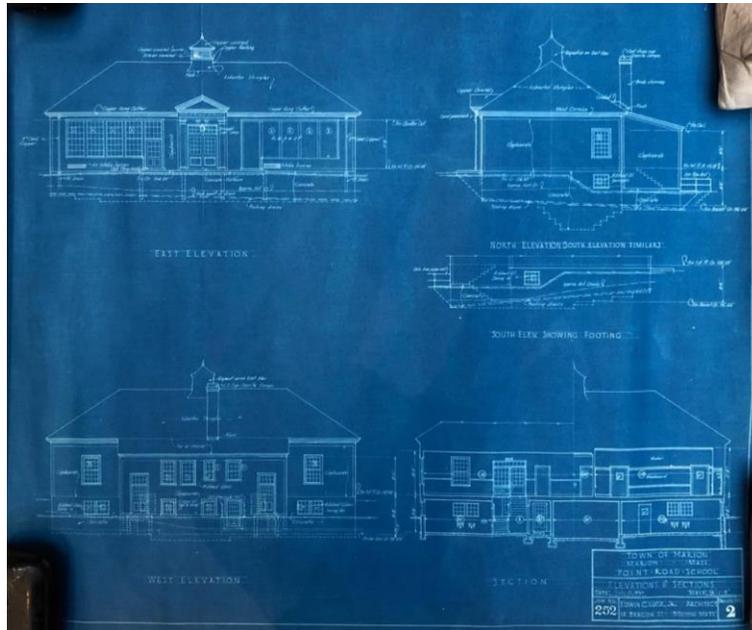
Plans, to the left, and elevations, above, for the Point Road School, 1930. Note that the building was placed perpendicular to Point Road. Massachusetts Archives Public Safety Records, file 38532
